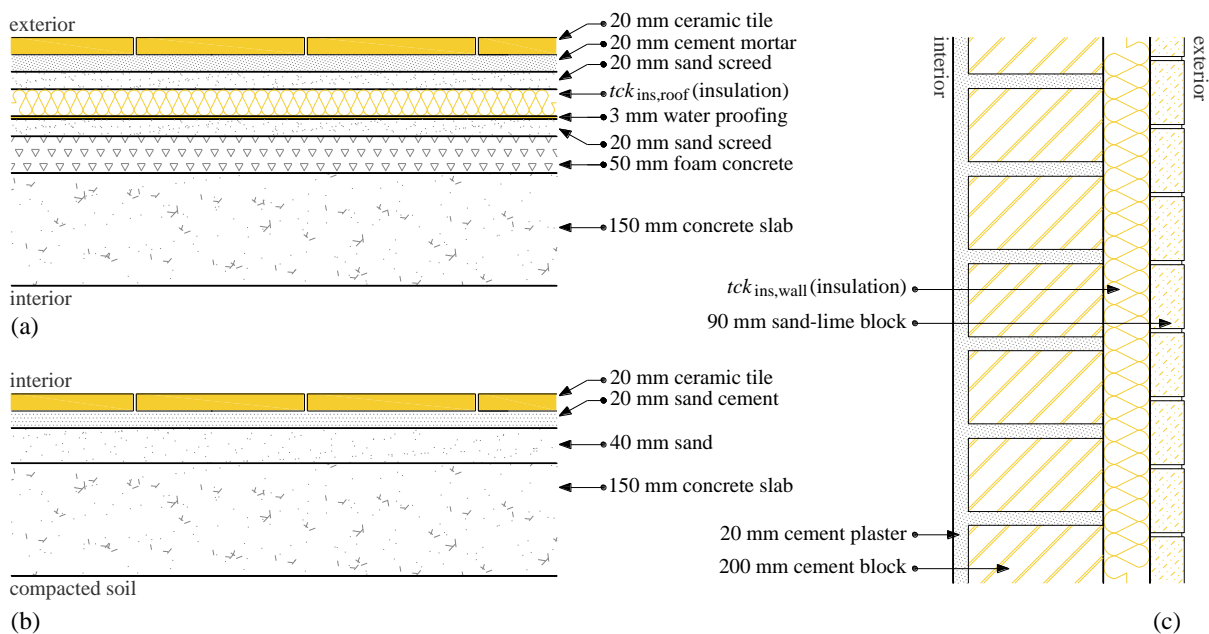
Cross-section of the construction elements used in the model: (a) roof; (b) floor, and (c) exterior wall (adapted from ref. [424]).
